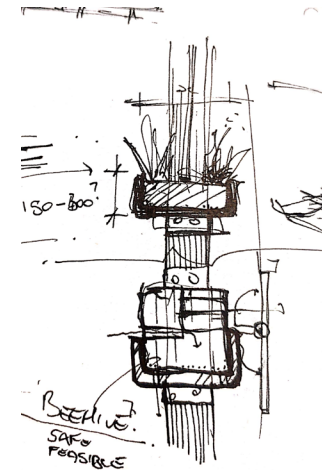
INITIAL DETAIL PLANTERS (AUHTOR 2021)
